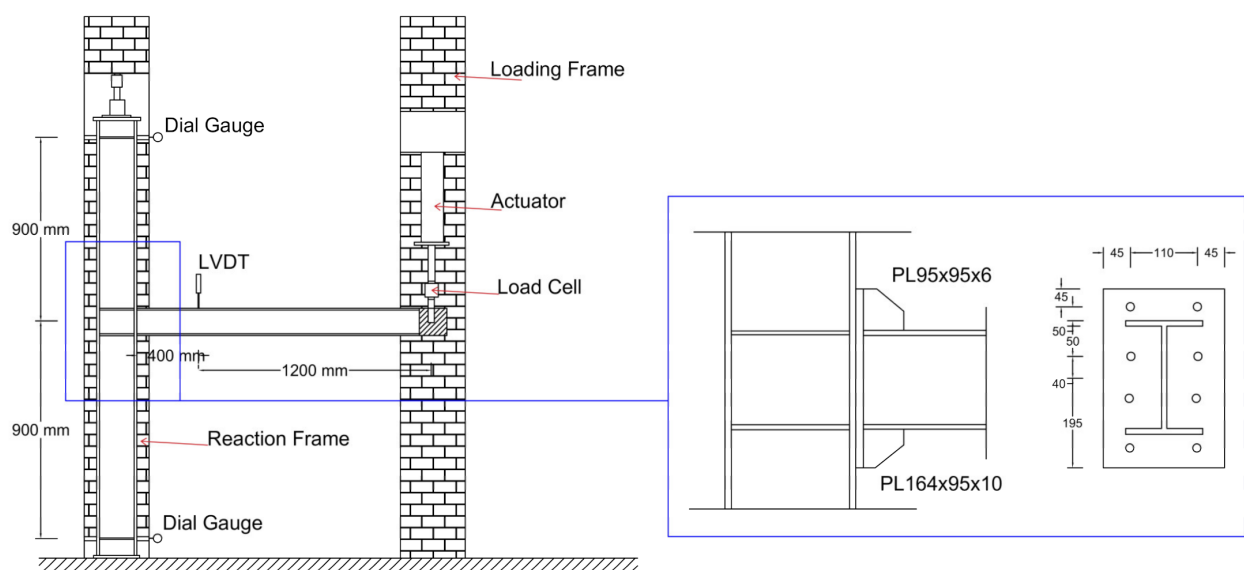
Geometrical details of the specimen [28] (units are given in mm, LVDT: linear variable differential transformer, PL: plate).
